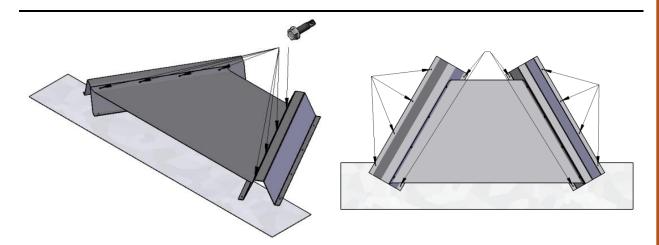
ASSEMBLING AND INSTALLING THE FIREPLACE BOTTOM STANDOFF
